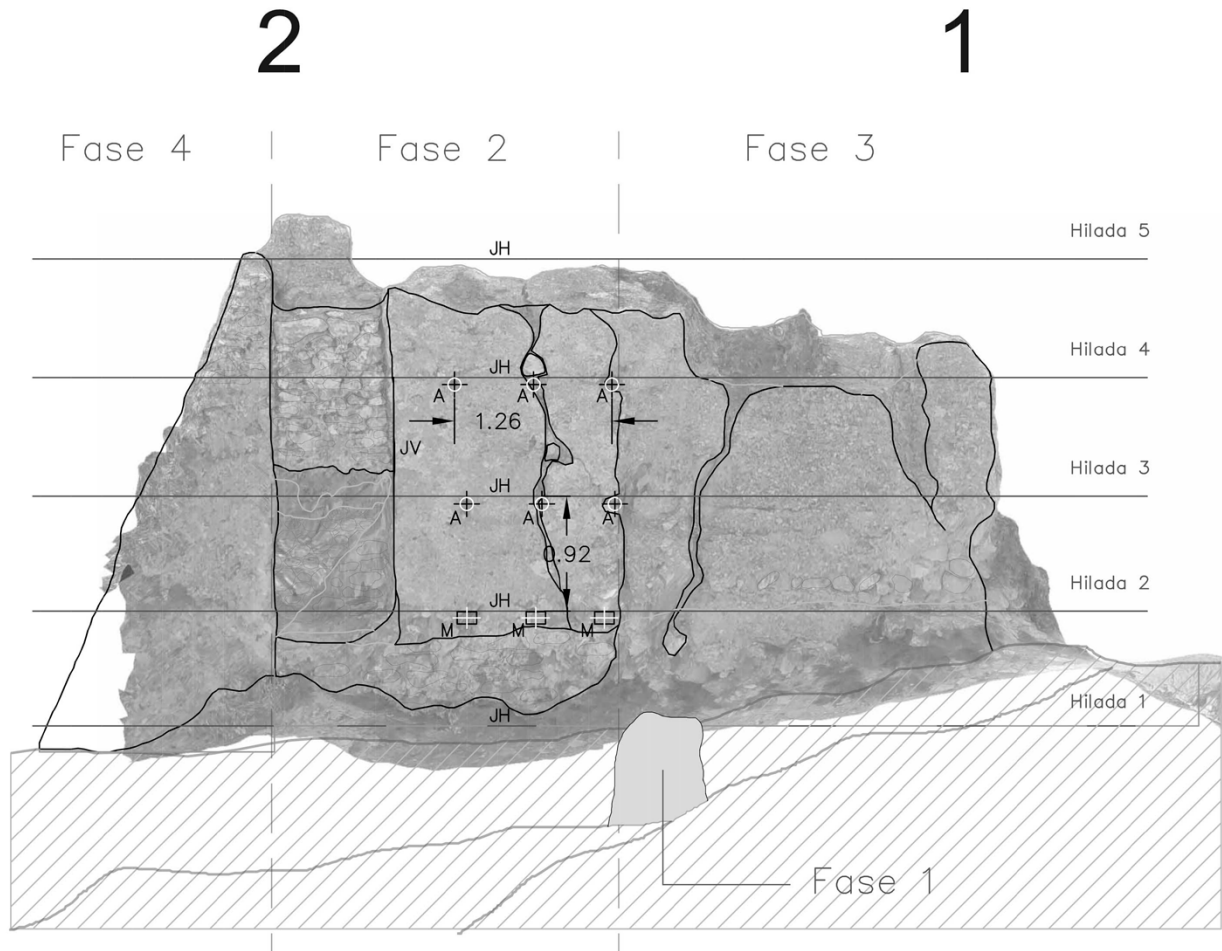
North elevation of lower tower on orthophoto. Architectural studio. (Own elaboration).
